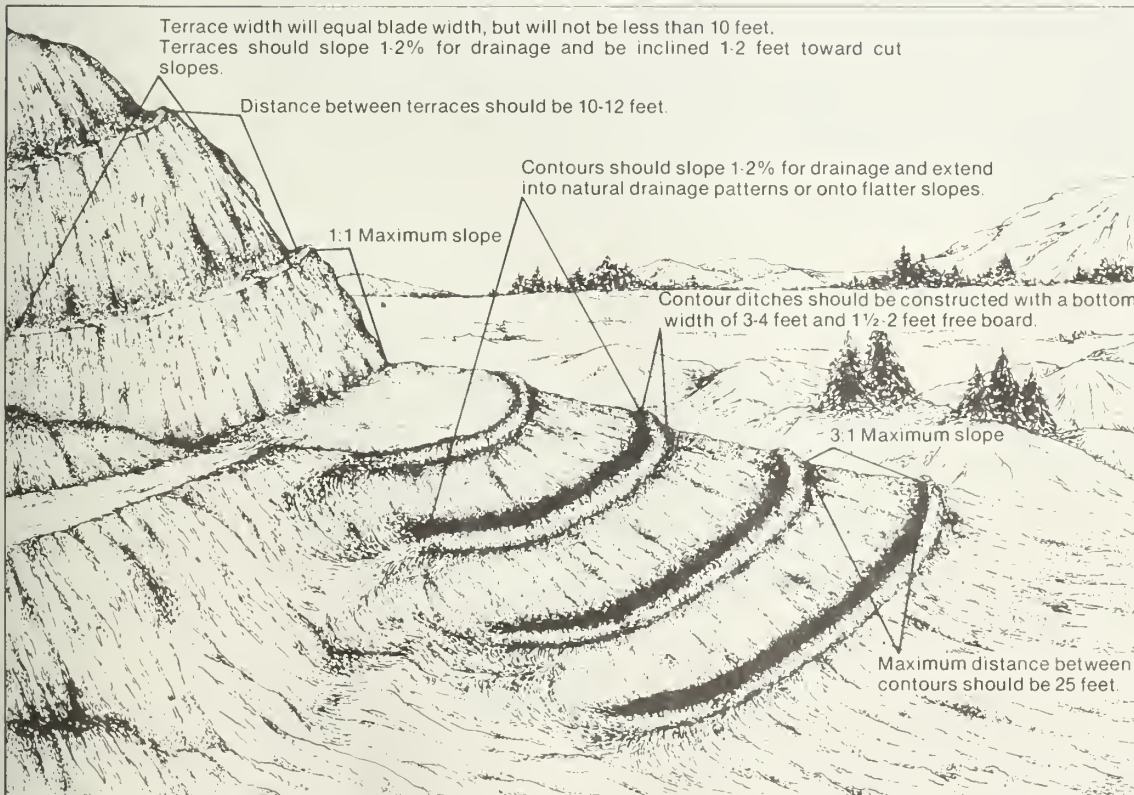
Well Site Restoration and Stabilization by Terracing Cut Slopes
